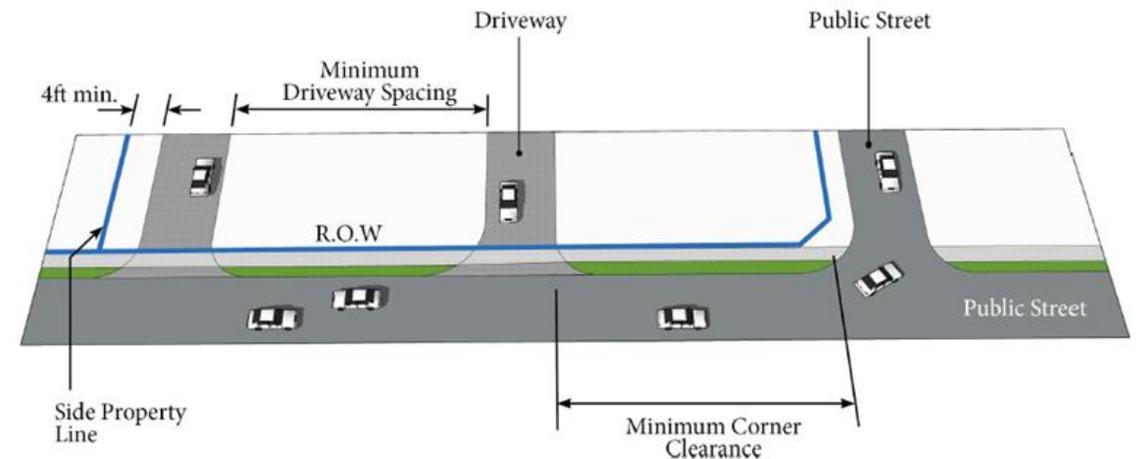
TYPE A & TYPE B DRIVEWAY SPACING
